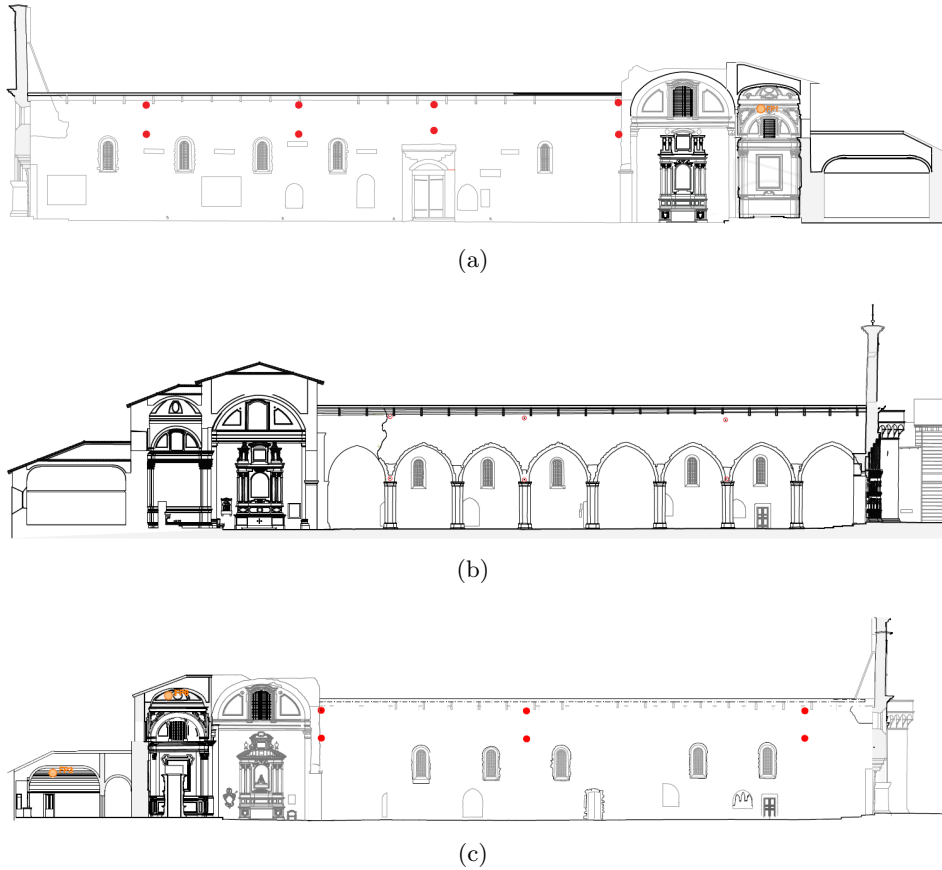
Prospect view of the layout of the FBA accelerometers on the Holy Door wall (a) and the adjacent nave walls (b)-(c).
